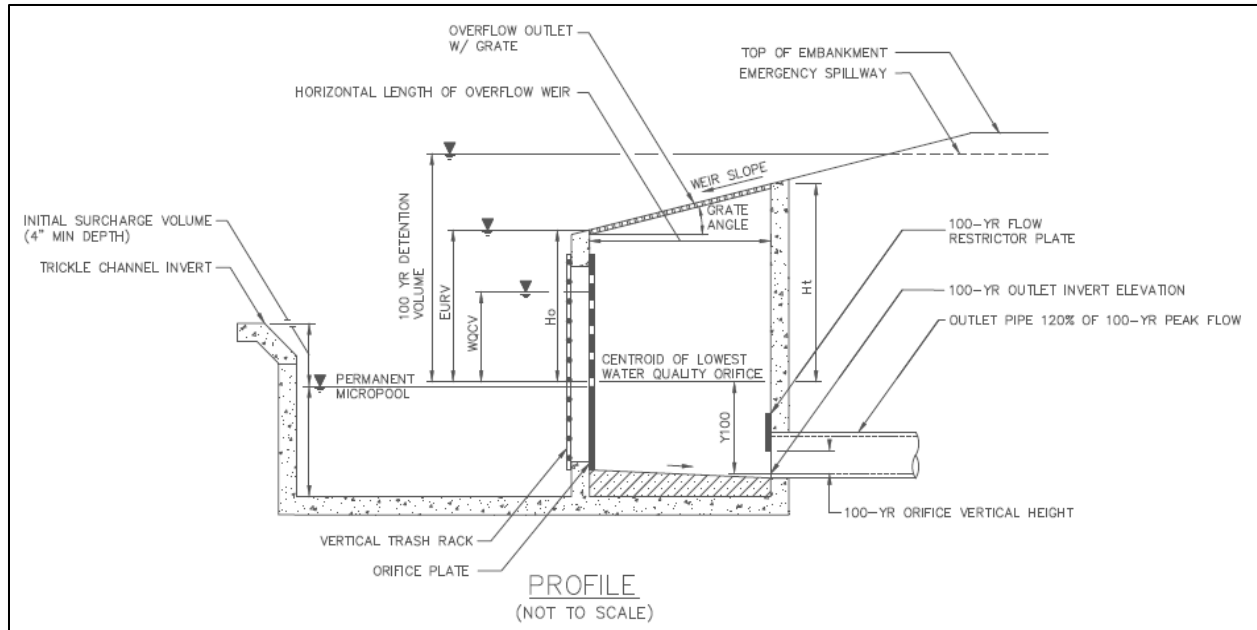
Section of detention basin outlet structure showing water quality plate and overflow outlet with grate.
